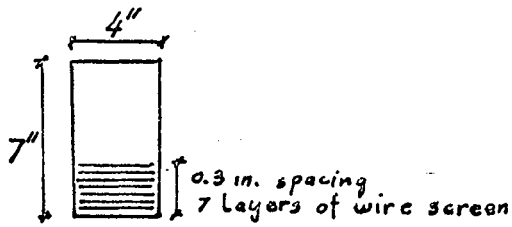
Cross-section of a Beam with Galvanized Wire Screen.
